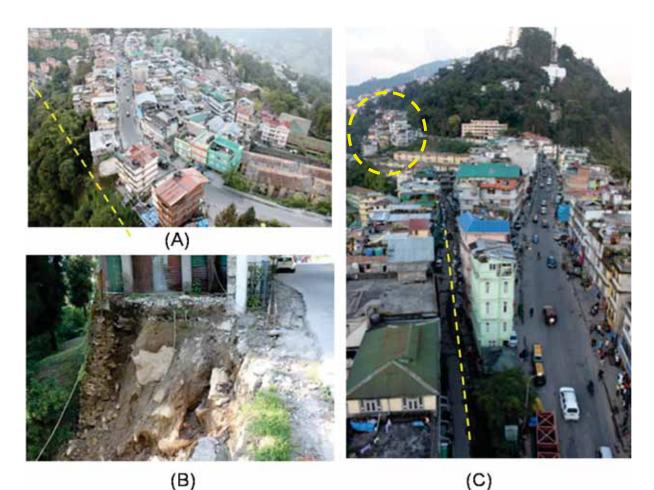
Buildings constructed on Unstable slope Areas with High Building Density
